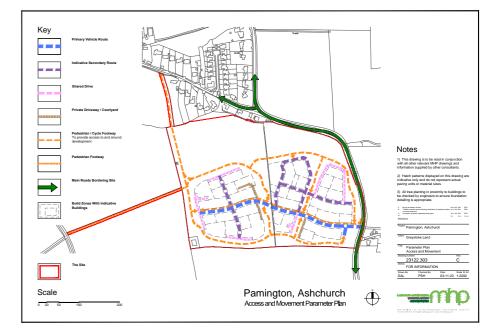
ACCESS AND MOVEMENT PARAMETERS PLAN
